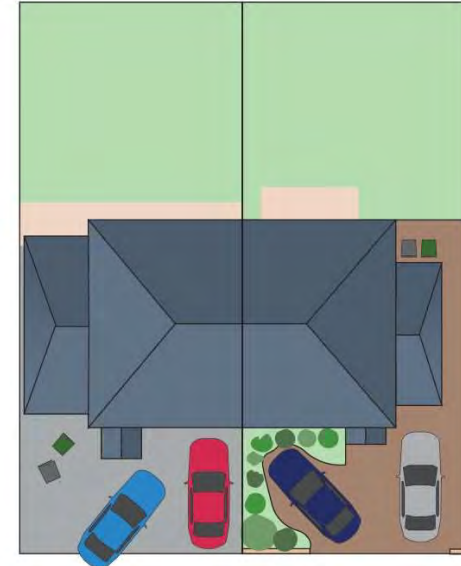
The left-hand side of the image shows a poorly designed extension with limited hardstanding parking, poor bin storage, no access to rear garden and loss of garden boundaries. Meanwhile the right-hand side shows a well-designed proportionate extension with permeable parking area, planting, access to rear garden and hidden bin storage
